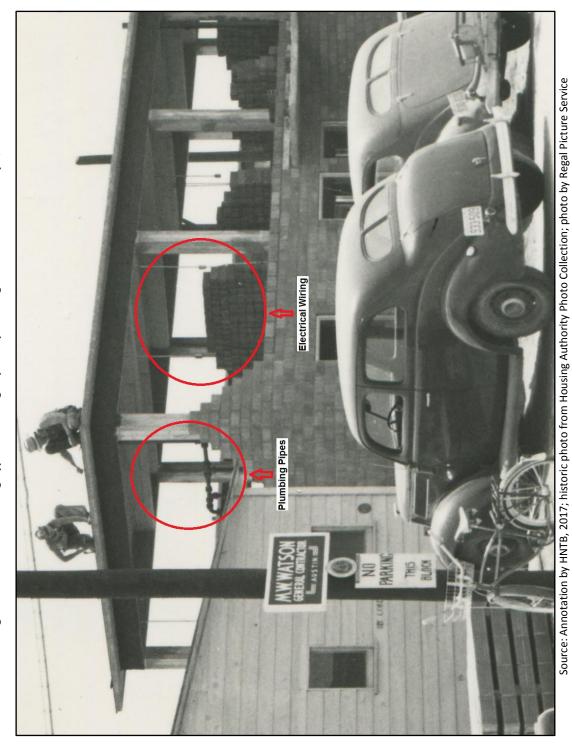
Detail of Building Type A showing exposed plumbing and electrical on May 8, 1940
